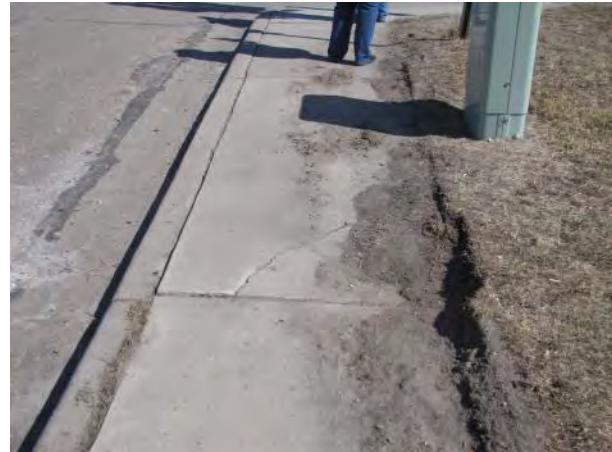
Dirt Blocking Sidewalk – SW Corner
